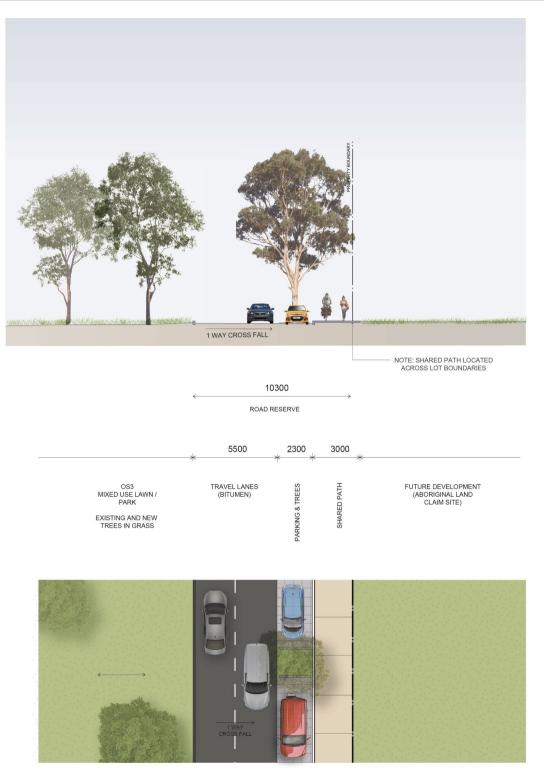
Typical street section 8 - East Circuit (north)
